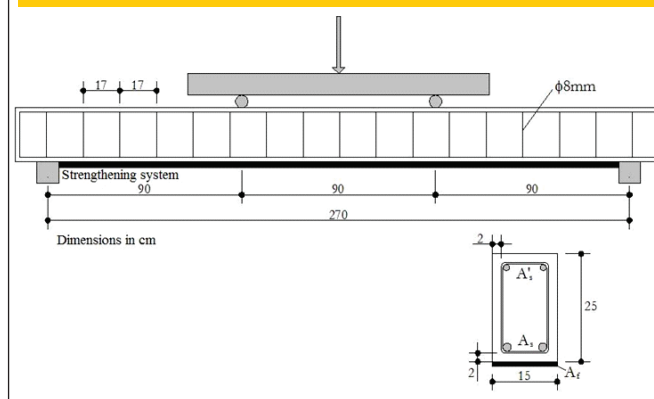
Longitudinal and cross section of the beams tested by Ombres (1)
